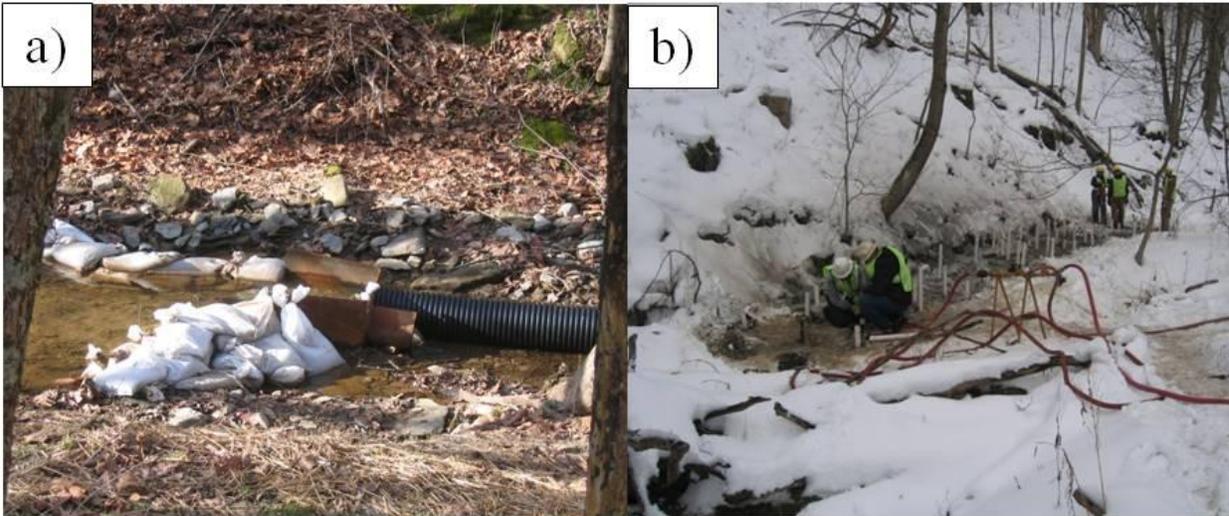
Grouting operation procedures. First, a) stream flow must be collected and diverted around the area where grouting will occur - shown at stream 32532 in Bailey Mine and then b) boreholes are drilled and clay pumped into fractures - shown at stream 32740 in Enlow Fork Mine (Photographs from PA DEP files).
